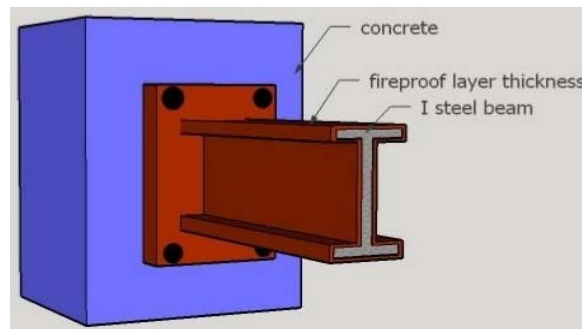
3D Model (concrete, fireproof layer, steel plate, steel beam)
